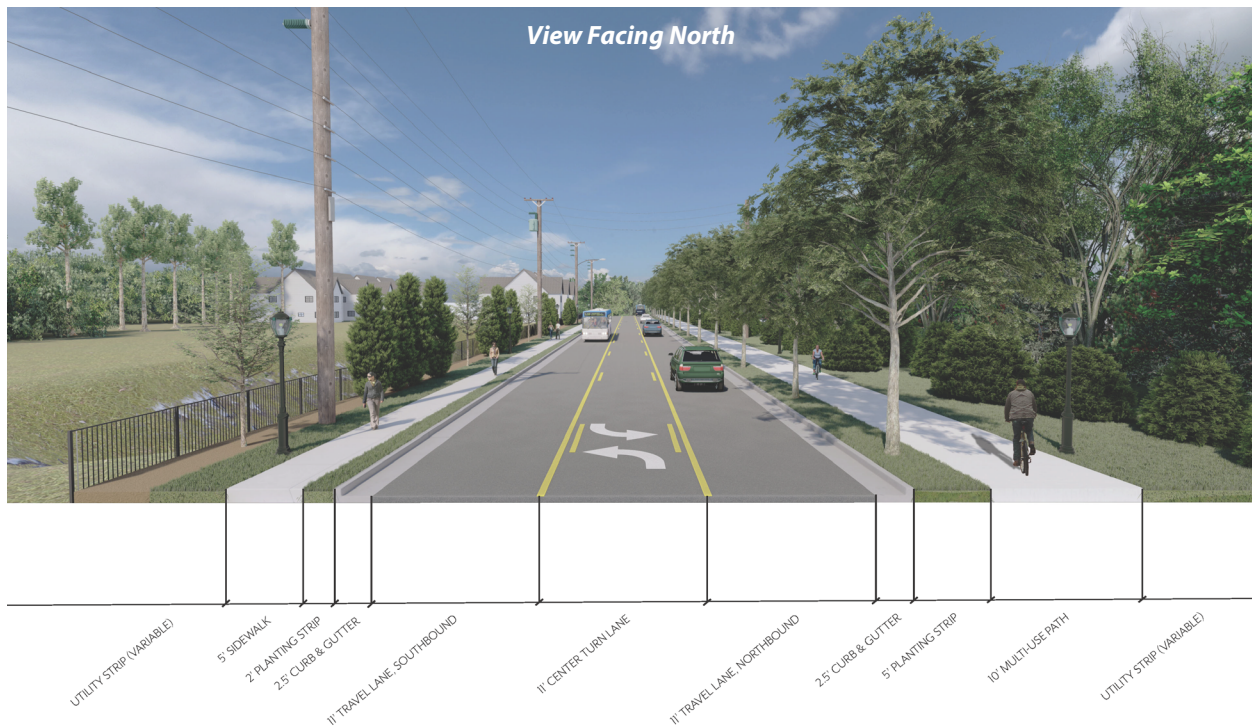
RECOMMENDED TYPICAL CROSS-SECTION FOR SEGMENT 2
